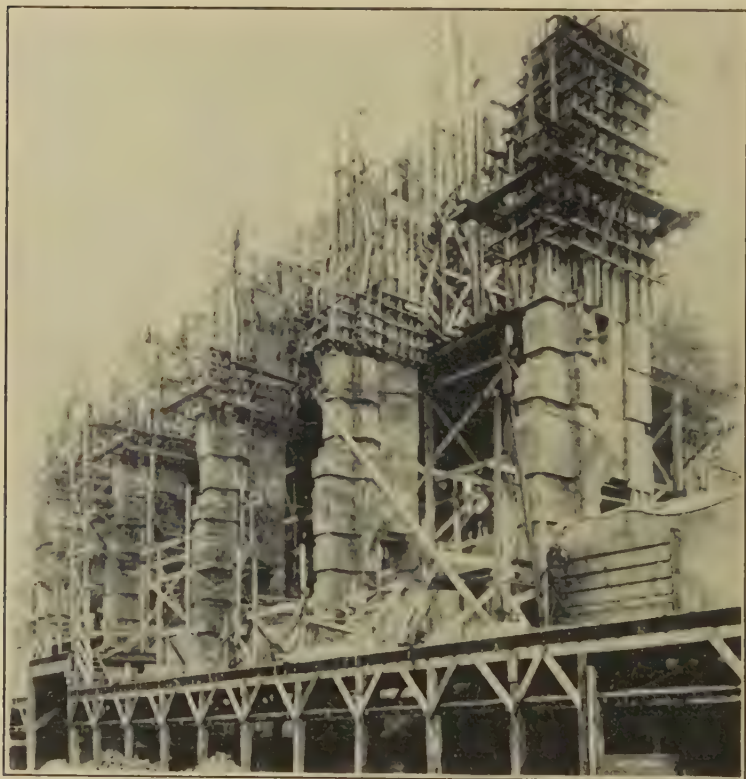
PIERS OF CHURCH OF HEAVENLY REST SHOWING RECESSES FOR BONDING FACE STONE.
